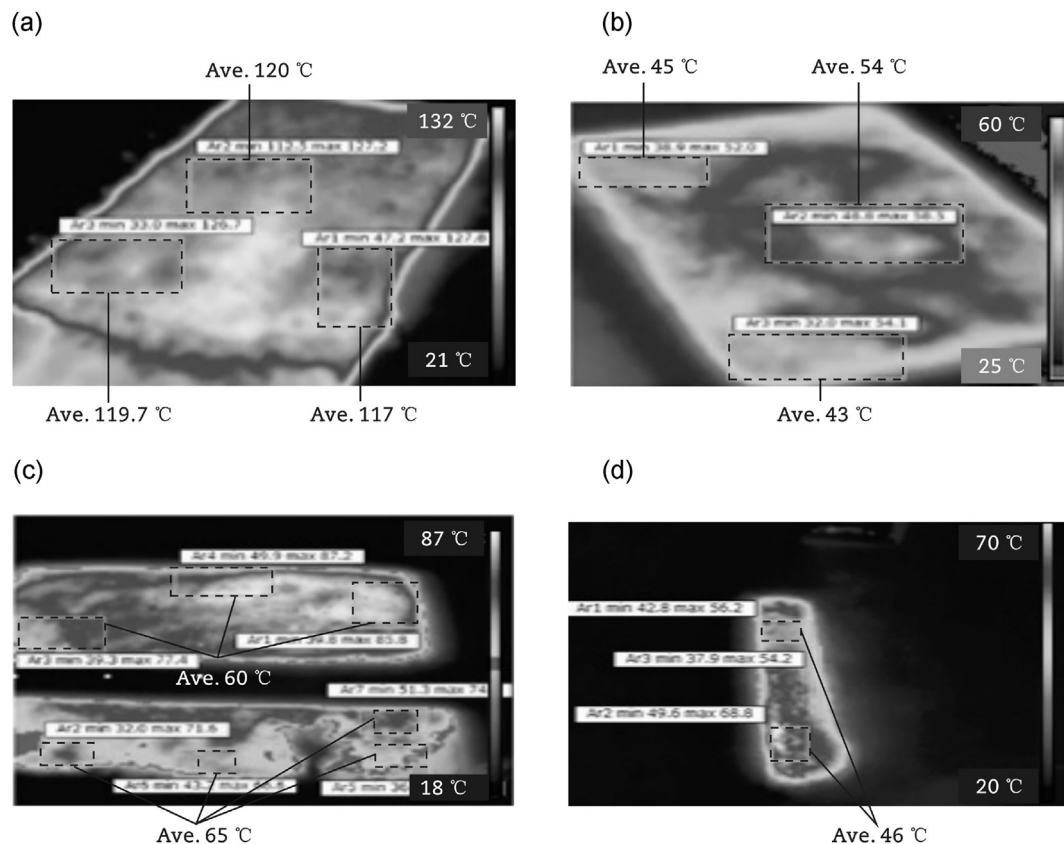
Thermal images of patch repairs immediately after compaction. (a) Repair site 7. (b) Repair site 8. (c) Repair site 9. (d) Repair site 10.
